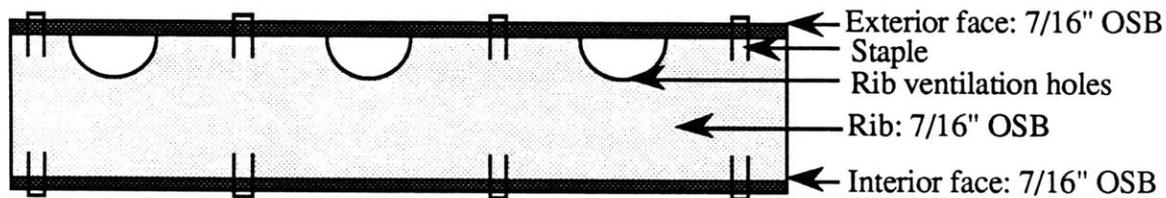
Rib notching for 2-way ventilation, panel longitudinal section
